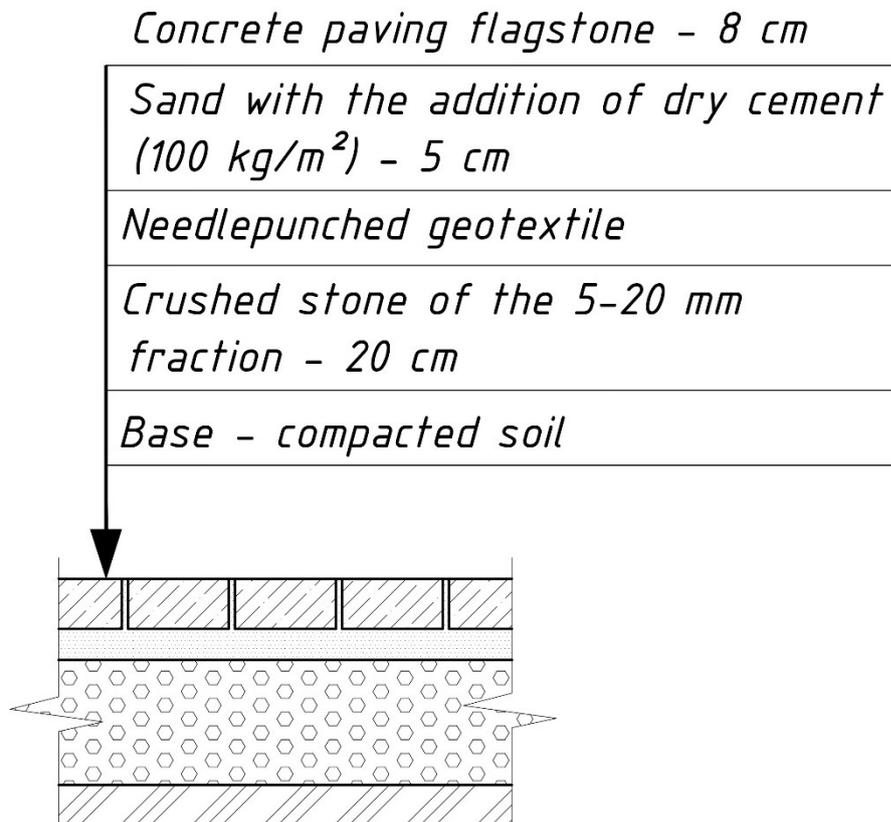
Paving construction made of paving flagstones, suitable for the passage of trucks and fire trucks
